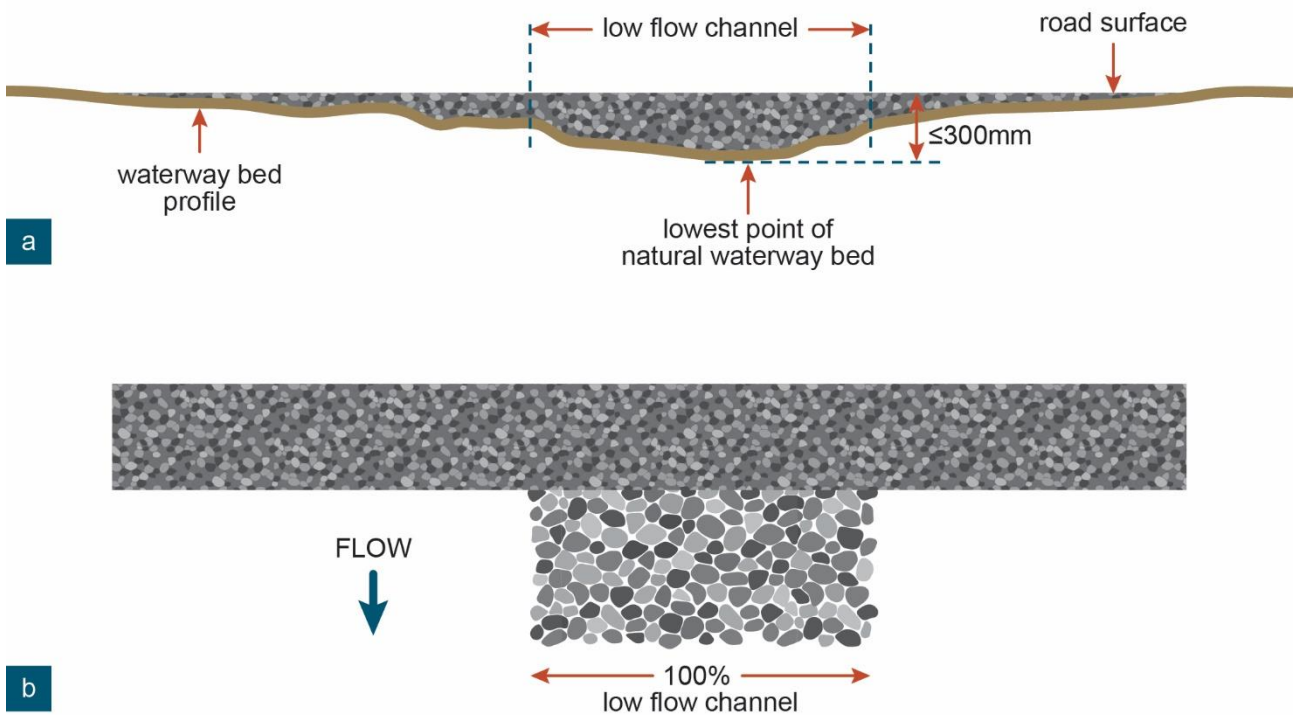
Low level crossing option 2 – green waterway (a) cross-section of waterway (b) plan view
